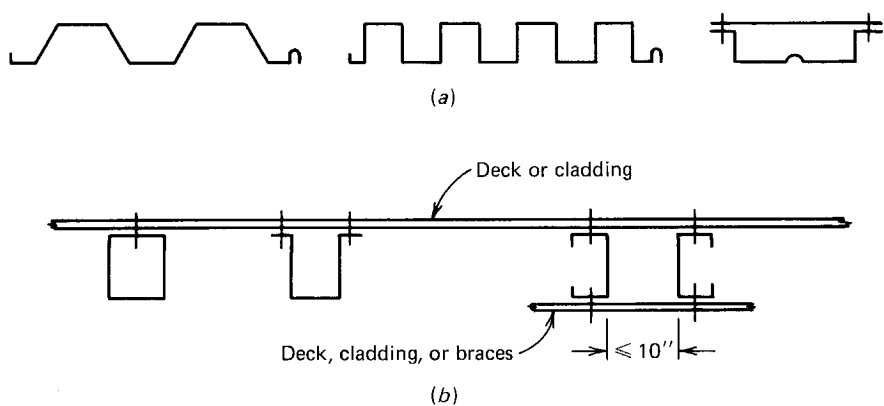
Sections used for AISI exception clauses.^{1.159} (a) Decks. (b) Beams.
